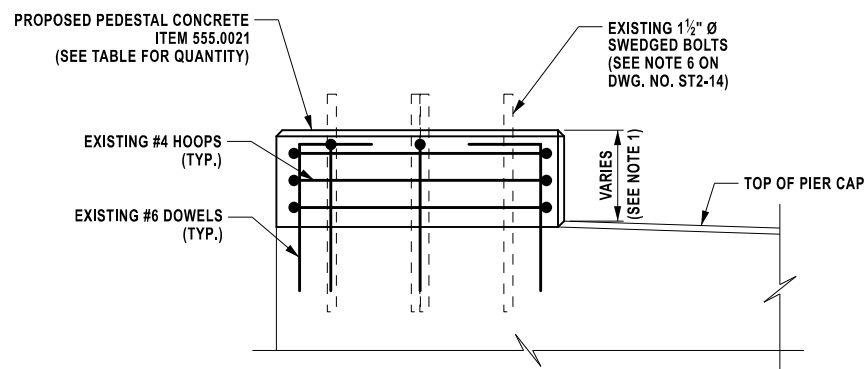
PEDESTAL RECONSTRUCTION PLAN - EXTERIOR COLUMN
